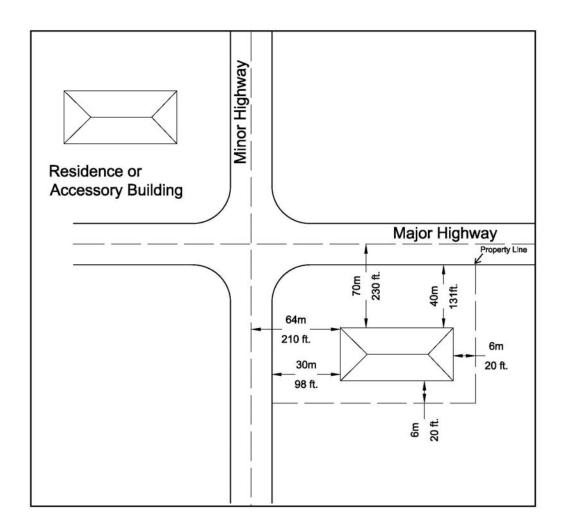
SETBACK FOR DWELLINGS AND ACCESSORY BUILDINGS FROM HIGHWAYS
